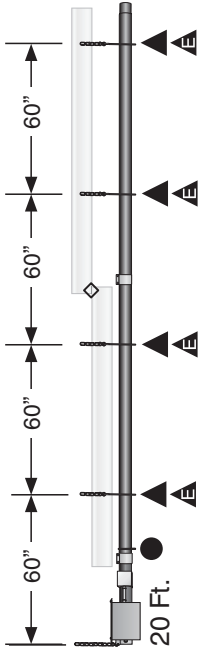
• Heater Suspension Layout • Five (5) Foot Truss Mounts
